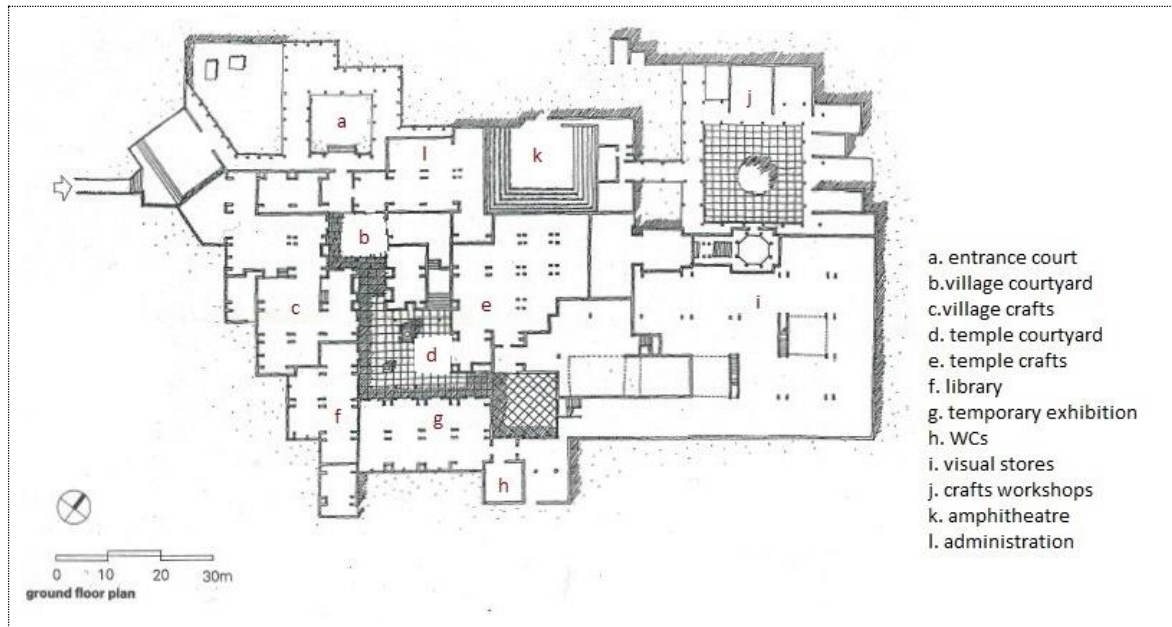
The ground floor plan of Crafts Museum in Delhi (Gangvar and Kaur, 2016)
